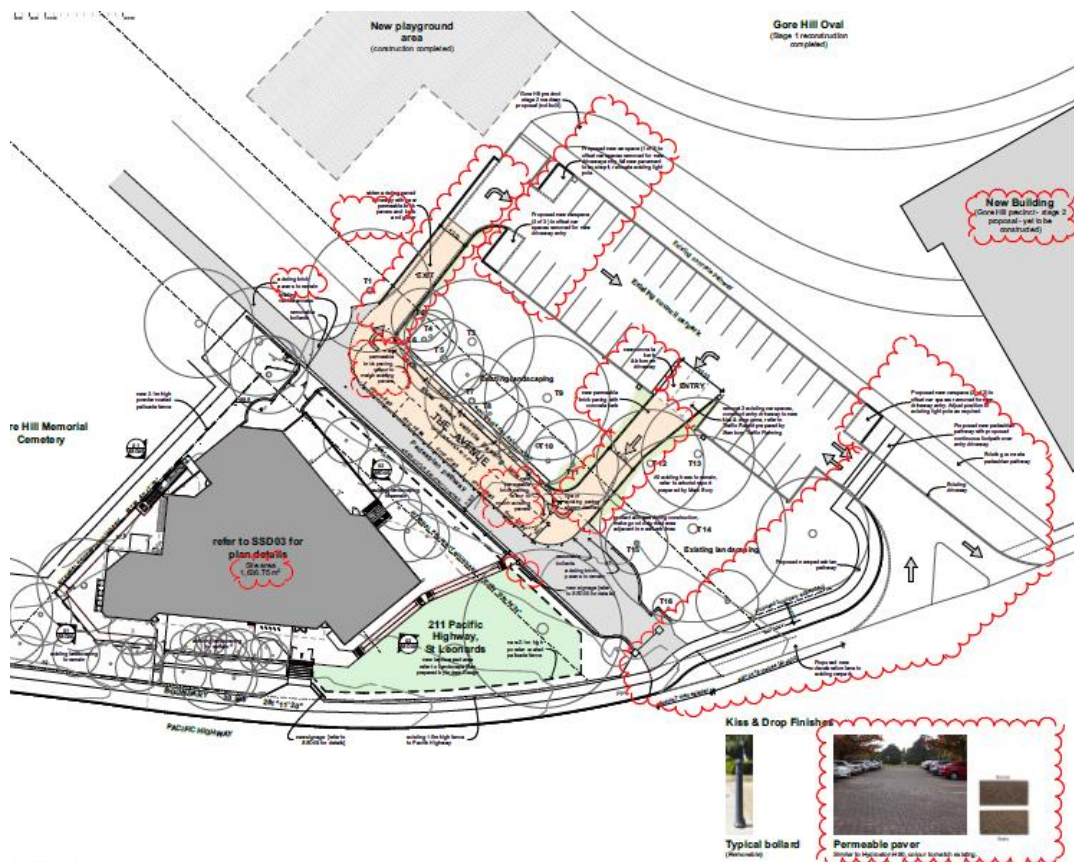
Proposed site plan. (Source: Stanton Dahl Architects)
